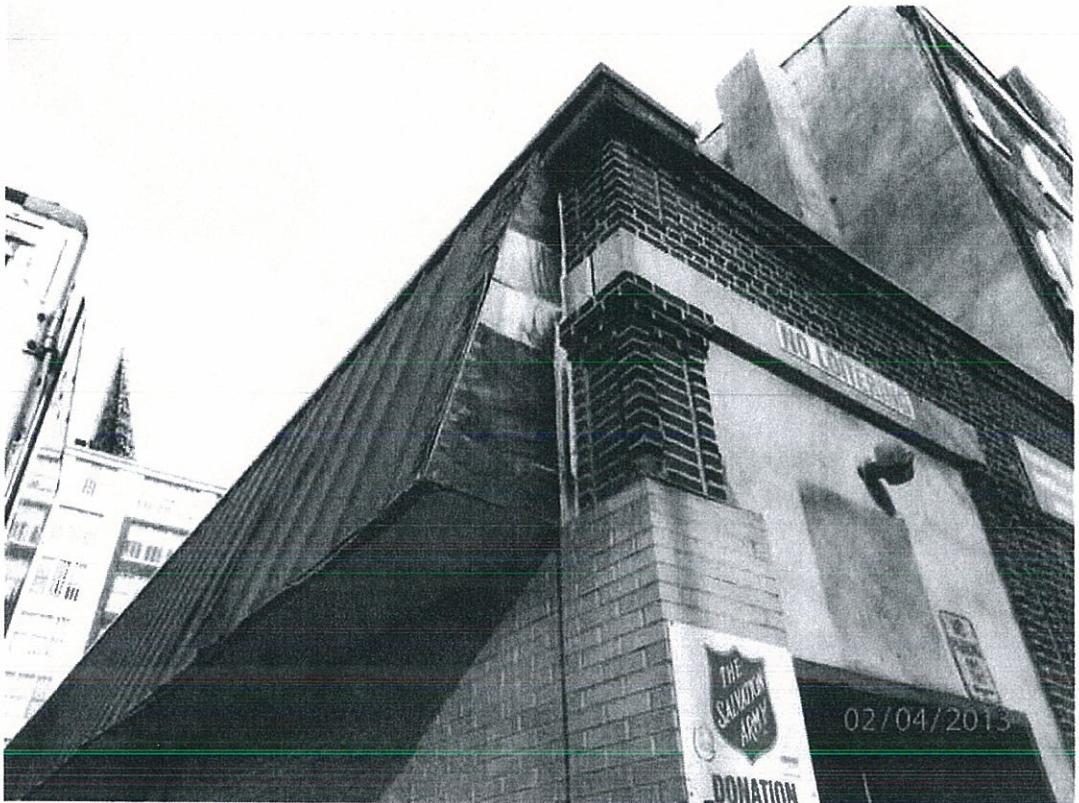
Façade Detail 2140 Market Street, Philadelphia, PA
